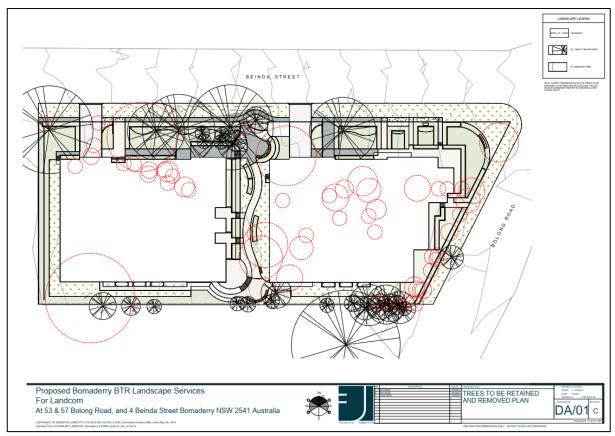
Plan showing the trees to be retained and removed. (Source: Edmiston Jones)
